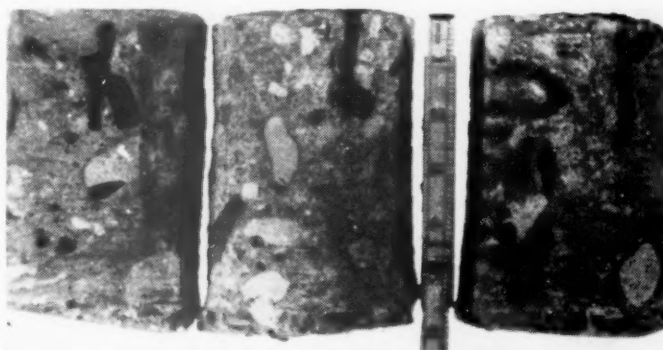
TYPICAL CORES DRILLED AT THE LONGITUDINAL JOINT IN THE 1942 INDIANA PAVEMENTS.
